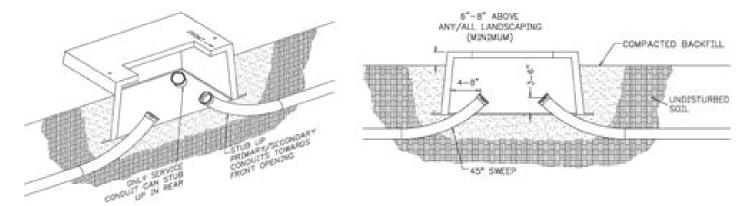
Top View/Side View - Single-Phase Sectionalizing Cabinet Box Pad
